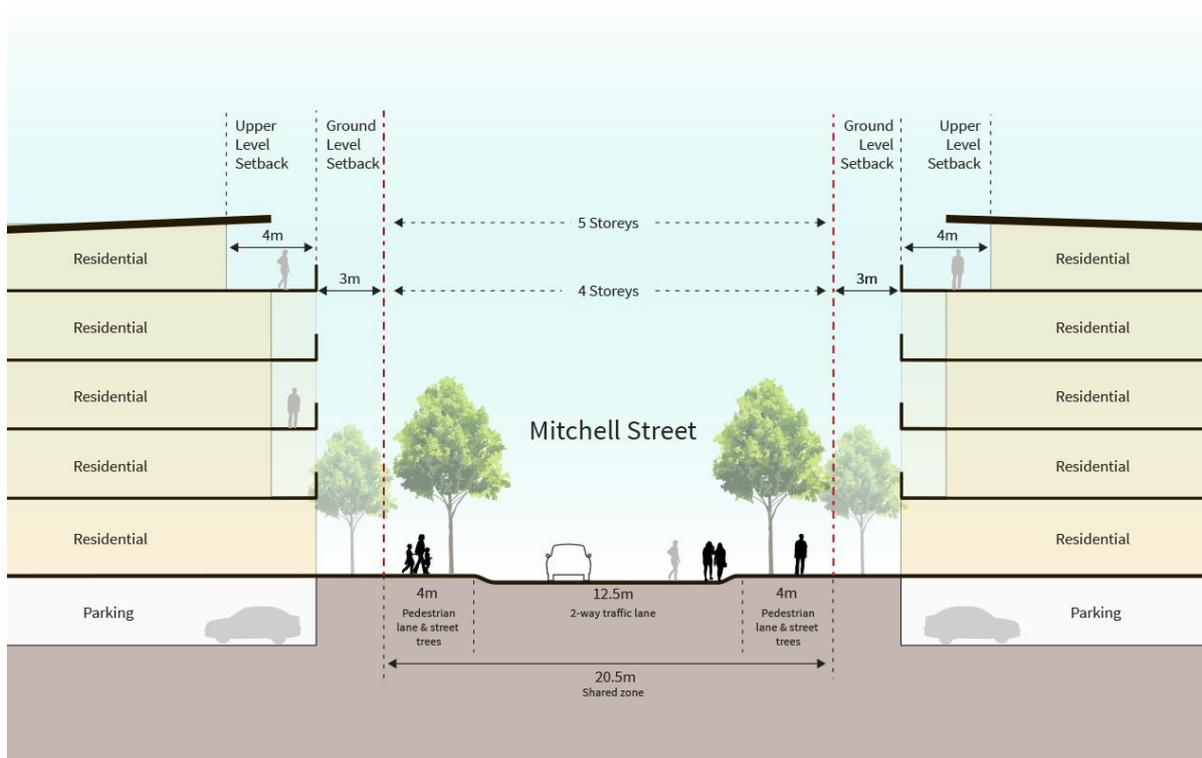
Street section 5 - Mitchell Street (Shared zone)
